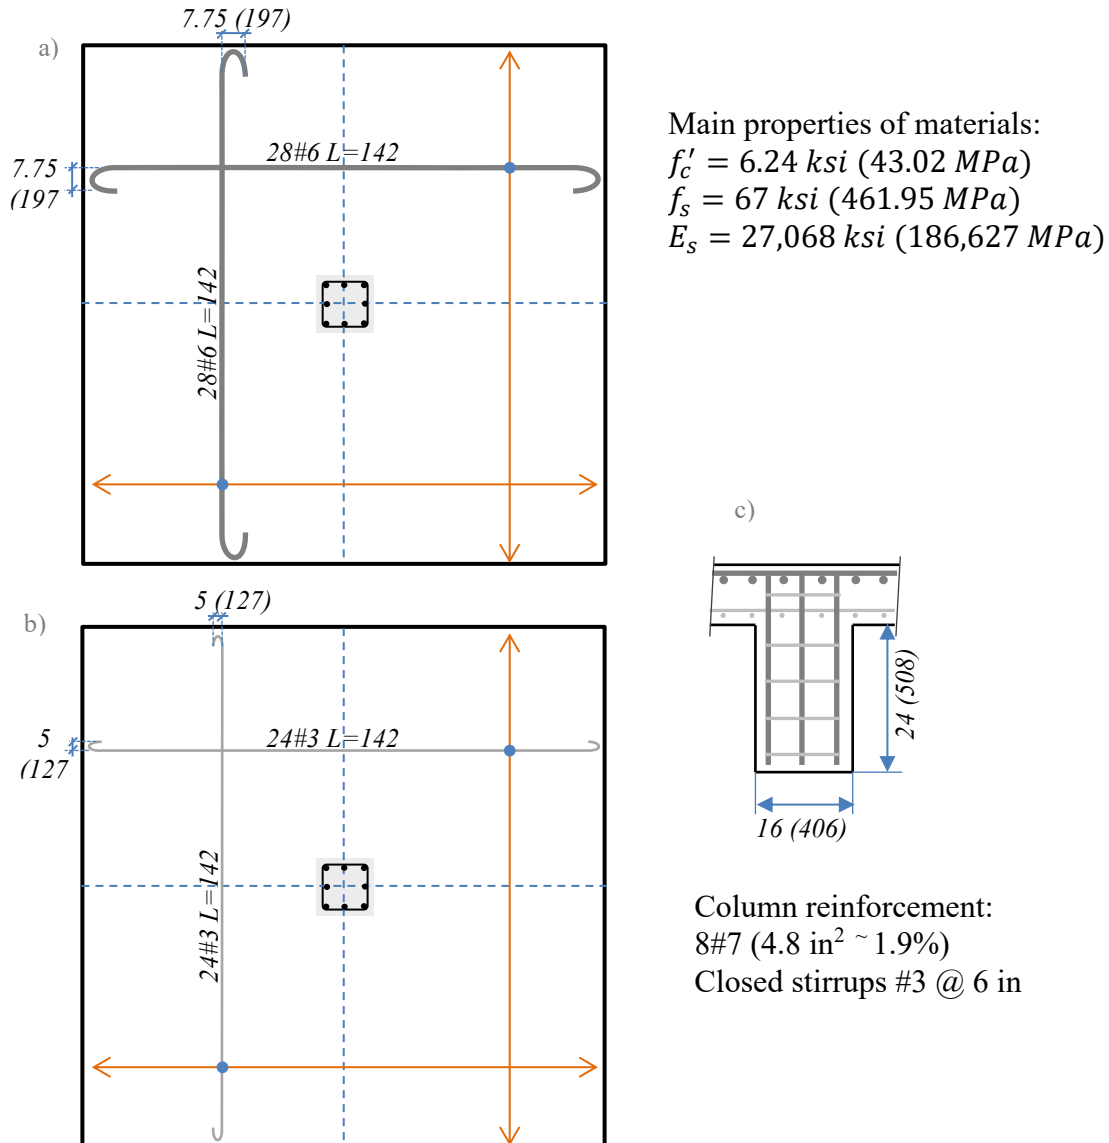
Main characteristics of specimen U-0.7. Detailing of: a) Top reinforcement; b) Bottom reinforcement; c) Column reinforcement
